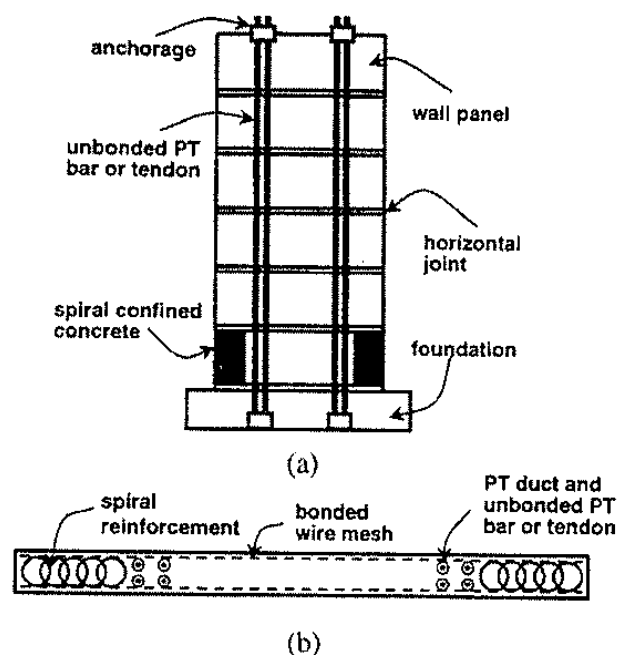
Unbonded Post-Tensioned Wall: (a) Elevation and (b) Cross Section Near Base (Enlarged)
